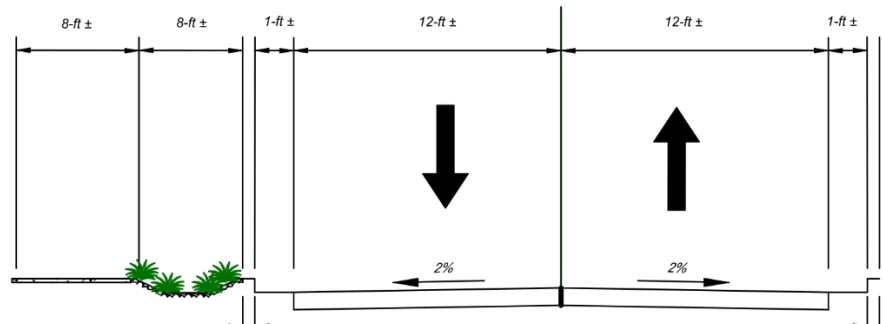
ARROWHEAD DR CURB & GUTTER - SECTION
